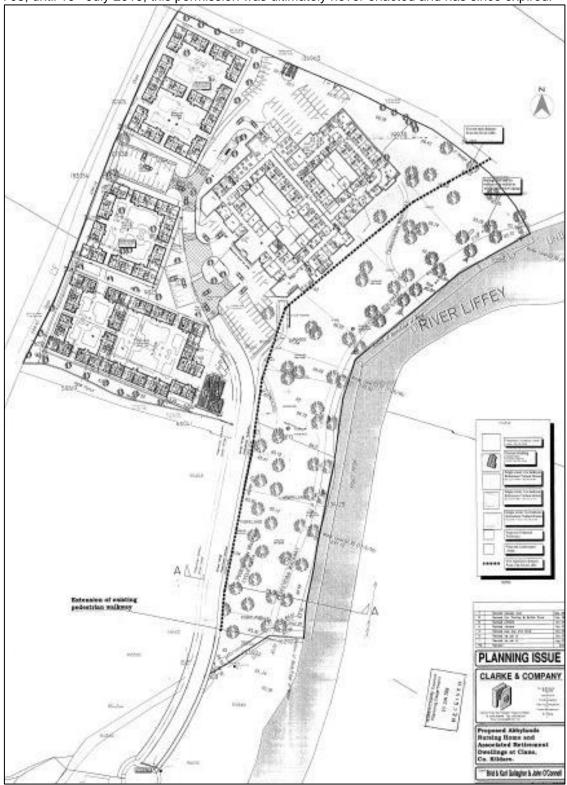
Site Layout Plan approved under Reg. Ref. 062674
